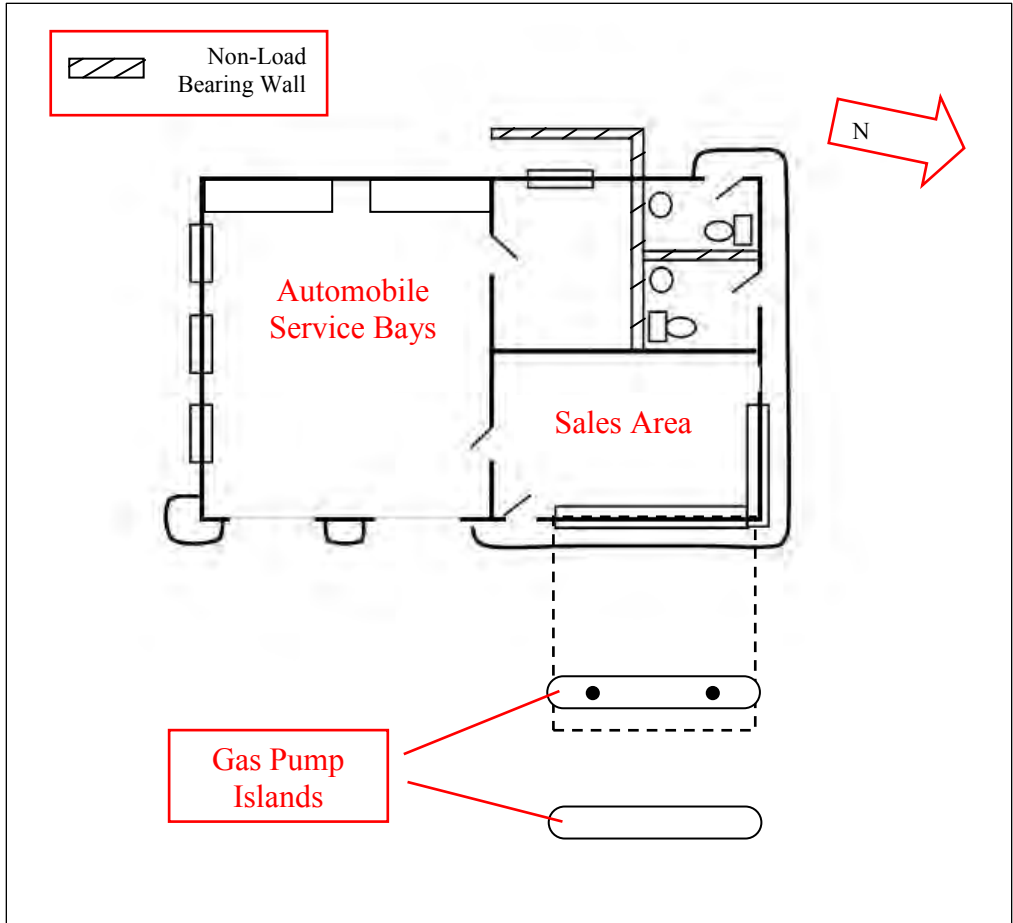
General Plan of Gulf Gas Station, 915 Capital Boulevard (WA 7363).
